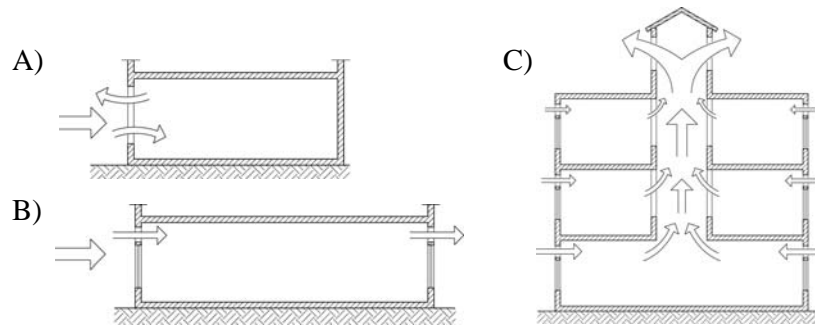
Natural ventilation principles. A) Single-sided ventilation, B) Cross ventilation and C) Stack ventilation.
